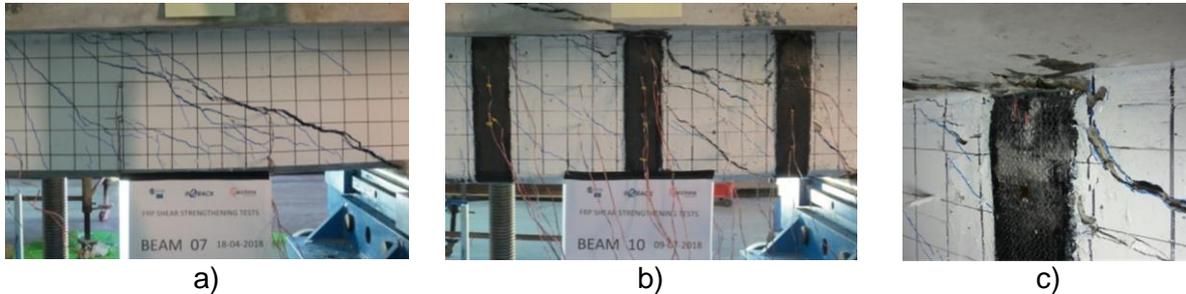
Shear failure mode of tested beams: a) non-strengthened B07; b) FRP-strengthened and anchored B10; c) anchor failure in B10 (pull-out).
